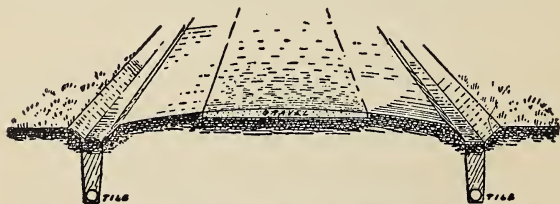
A gravel road properly crowned, with side ditches and tile drains.
